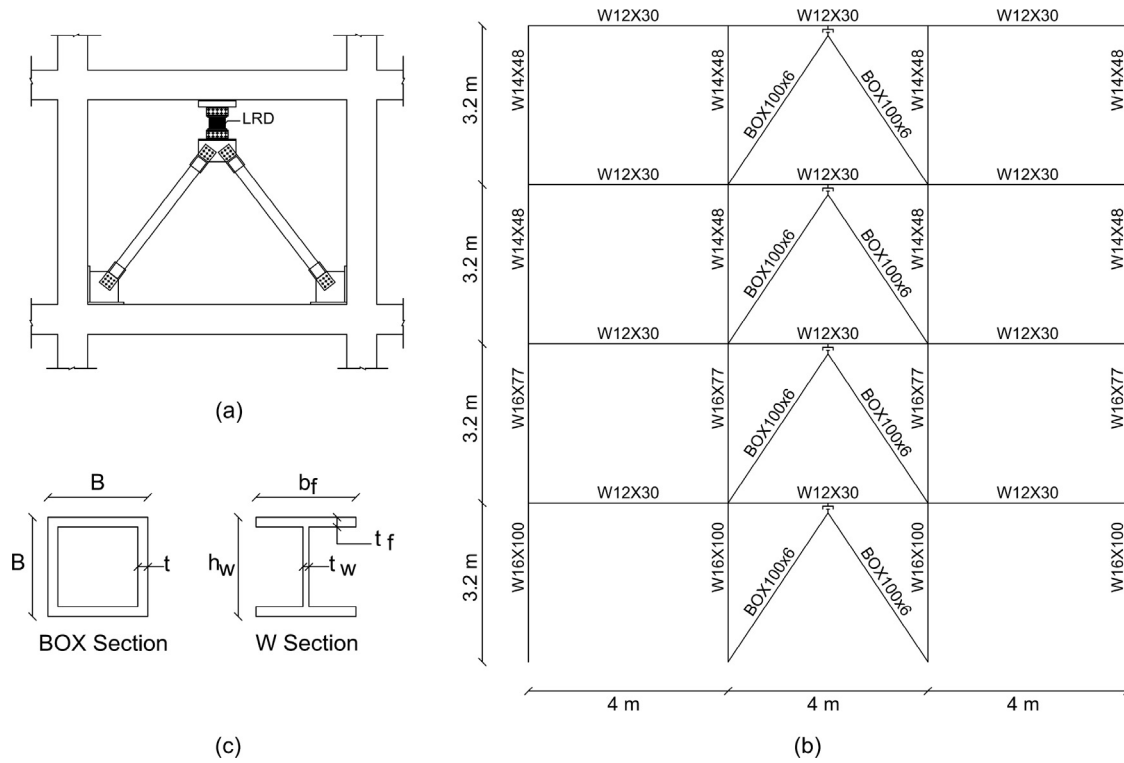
(a) Overall location of the LRD on the chevron bracing (b) four-story steel frame with the damper (c) the beam, column and brace cross sections.
